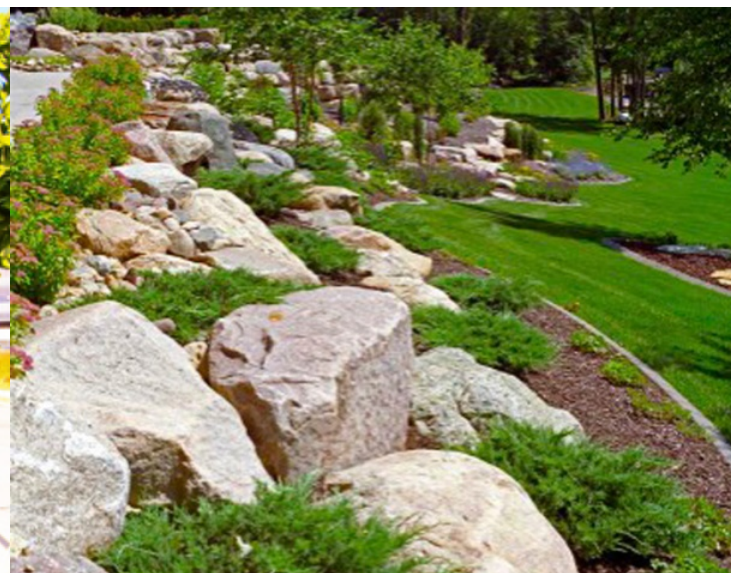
Random stack boulders providing informal retaining to garden & allowing pockets of garden.
